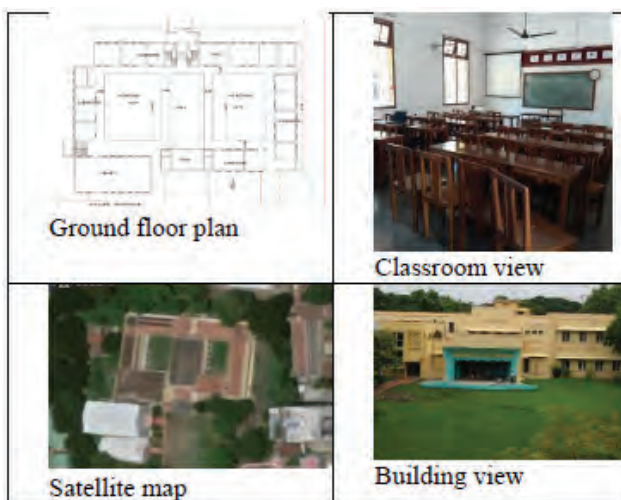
Traditional Building – Plan, View, Satellite Map and Building View
